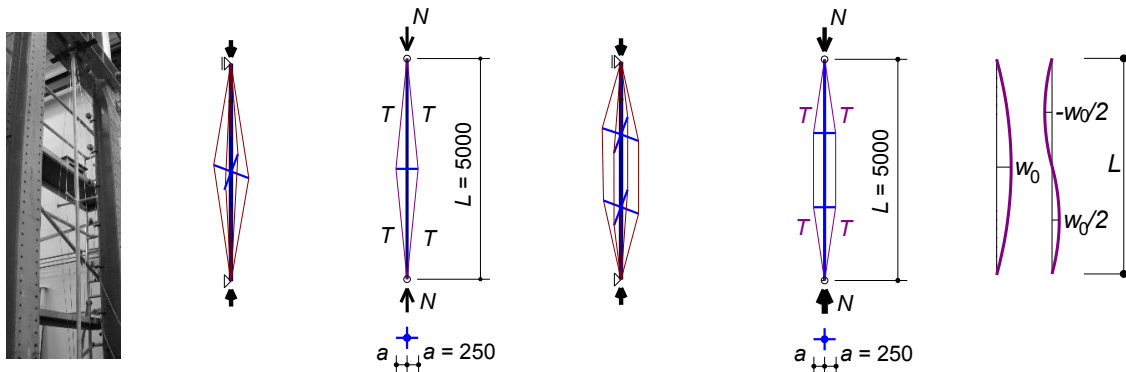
Photo of tested stayed columns, geometry of analyzed columns with just one central crossarm or two crossarms located in the thirds of the column length and considered initial deflection modes.
